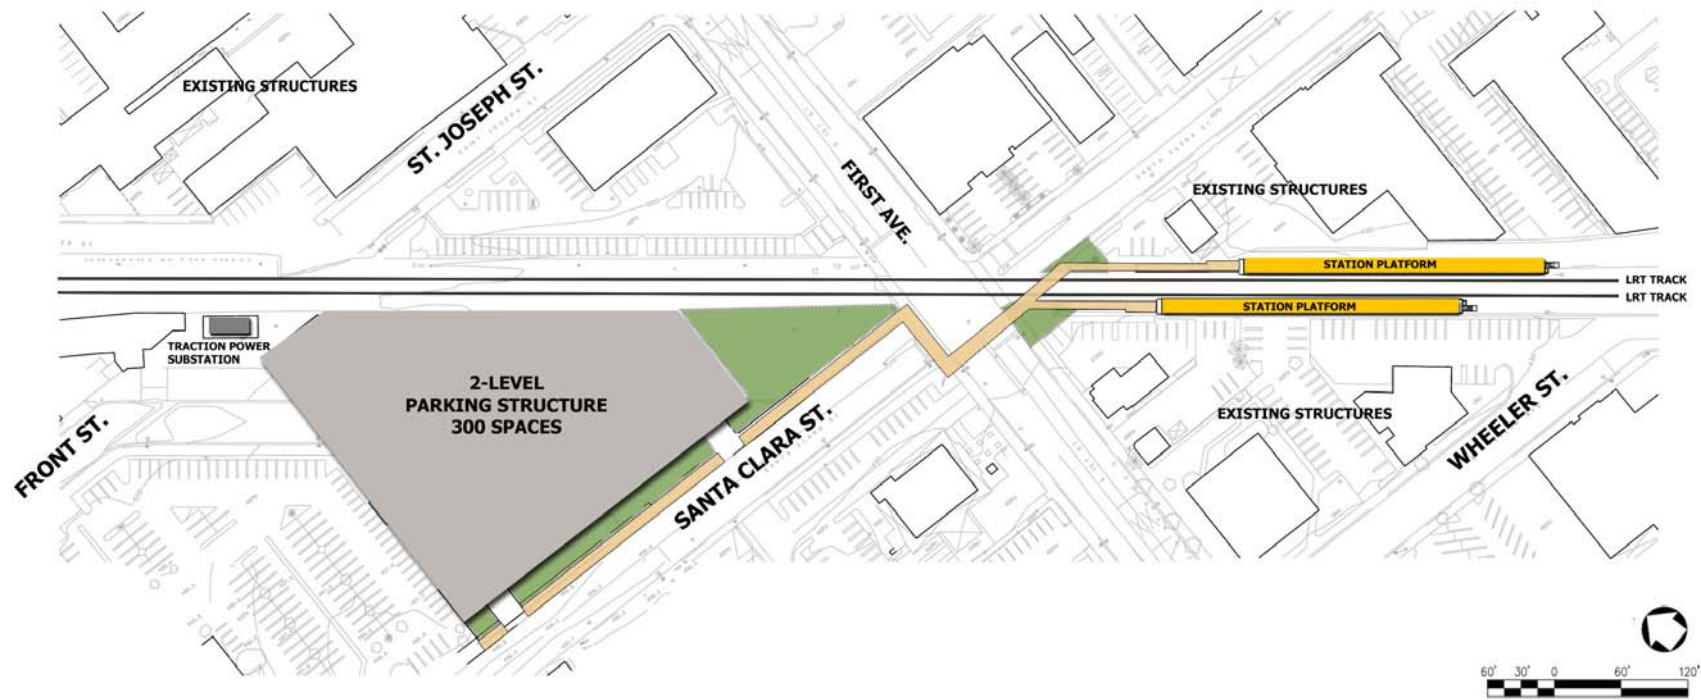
Site Plan: City of Arcadia Station, Option A
